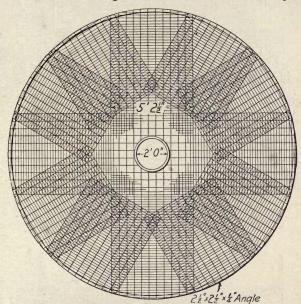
Plan of Fabric in Roof Tank for American Steel & Wire Company.
